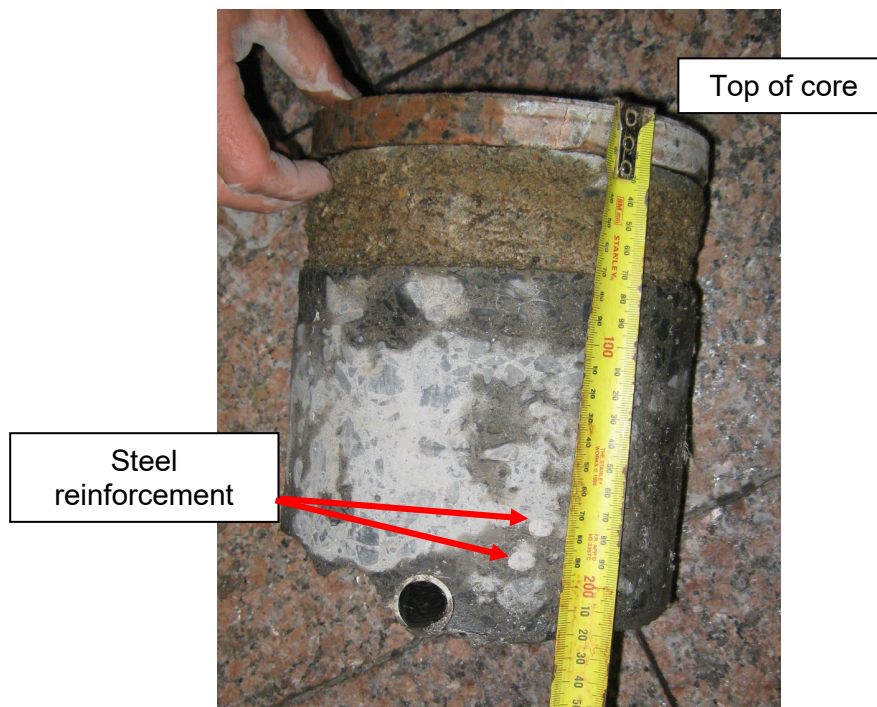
View of concrete core from Borehole BH1005, showing a cemented coarse sand matrix between 0.02-0.07 m over a concrete slab. Reinforcement steel (8 mm diameter) was encountered in the lower part of the slab at 0.17-0.2 m depth, above an empty plastic conduit.
